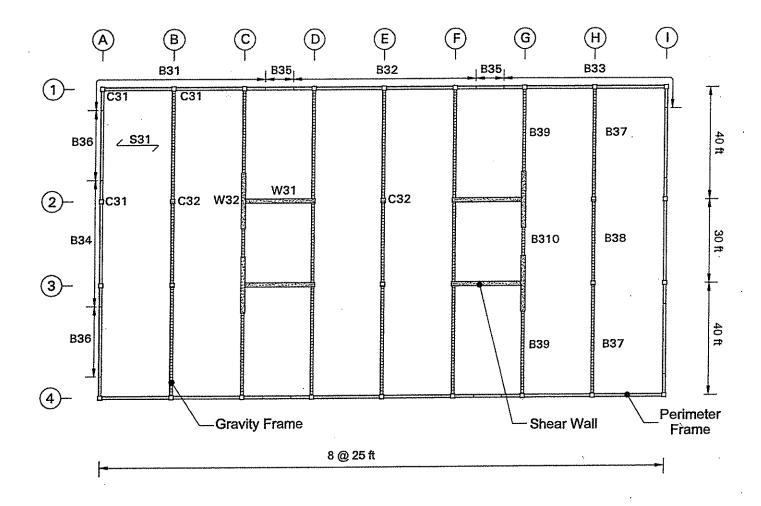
Typical Floor Plan of the Demonstration Structure Using 3D-APC System
